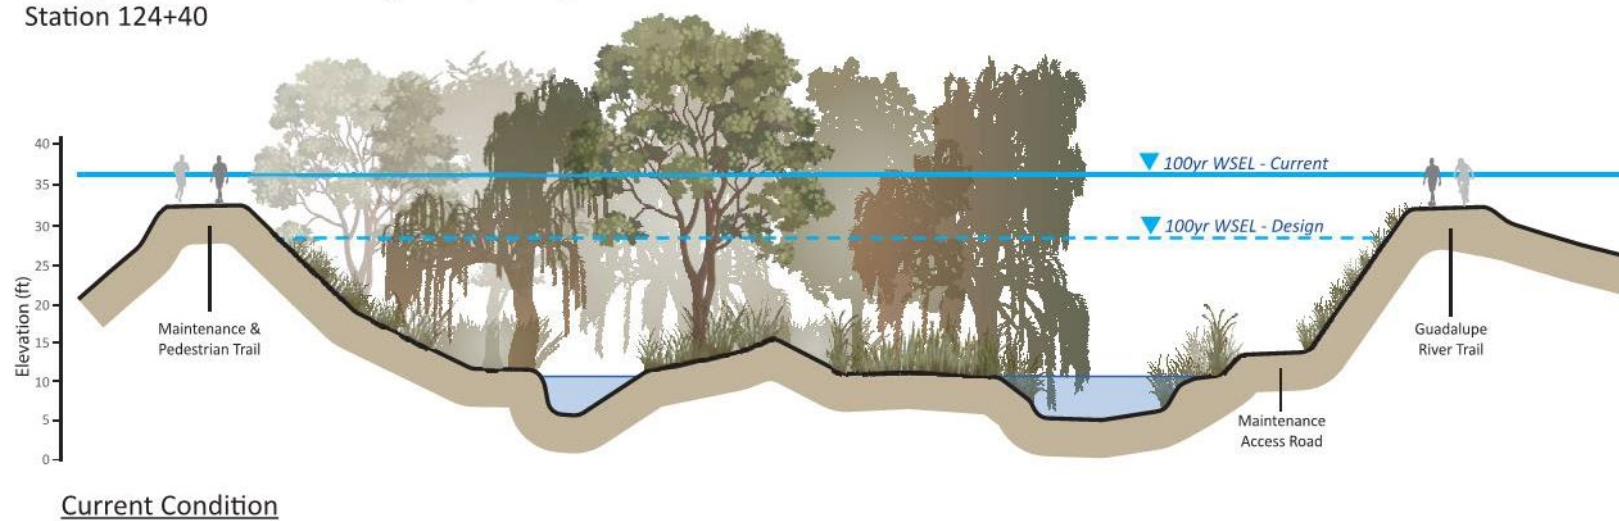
Typical Section -Trimble Road to Montague Expressway
